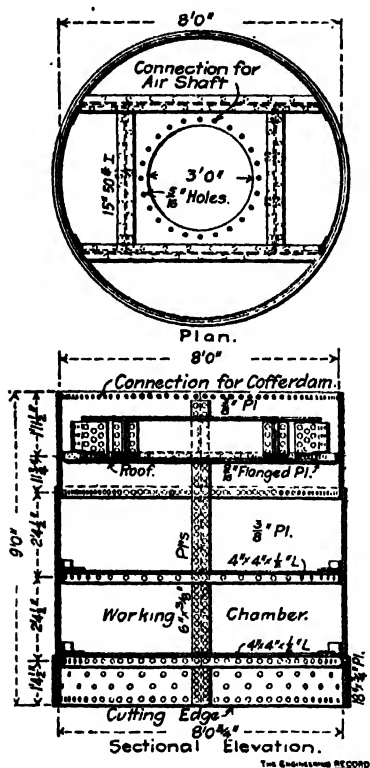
Caisson for Inside Column. Foundation, Mutual Life Building, New York.
